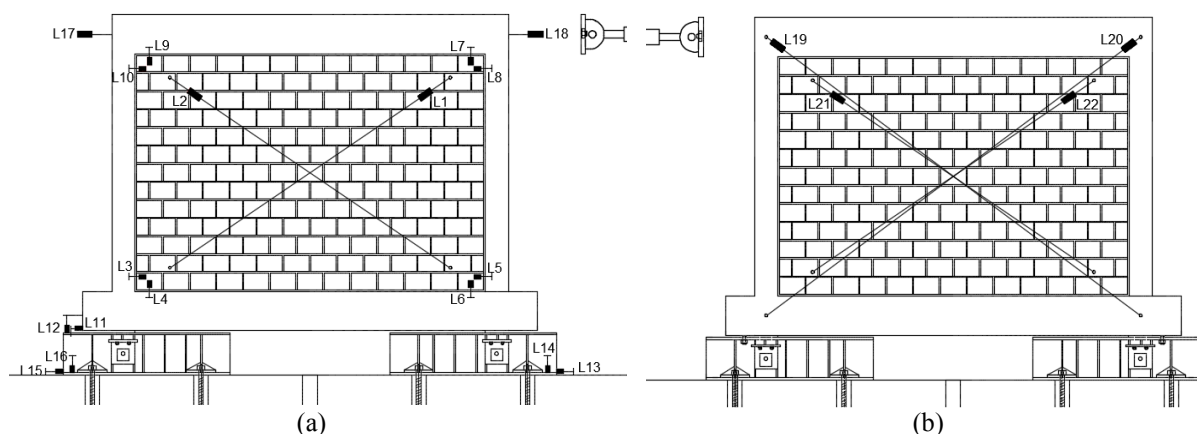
Instrumentation plan for in-plane loading; (a) front view; (b) back view
